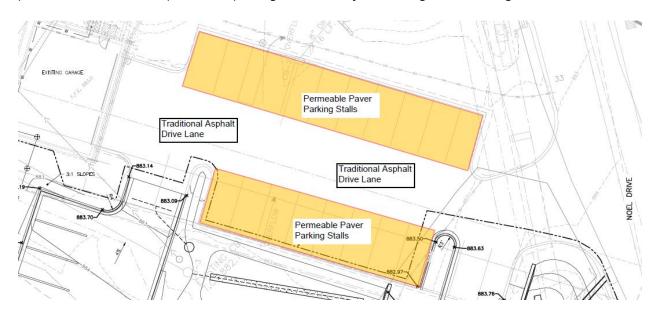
This concept shows the porous asphalt removed and replaced with permeable pavers in the parking stalls and a traditional asphalt drive lane.
